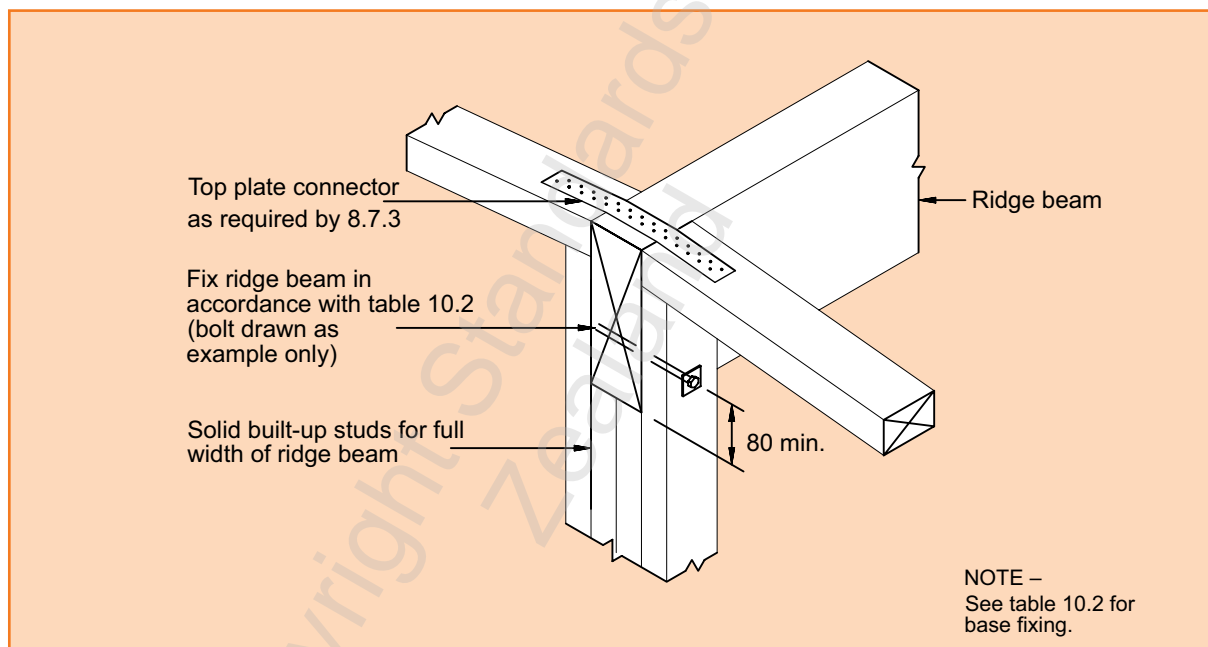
Example of fixing ridge beam to wall ([see 10.2.1.5.2](#))
